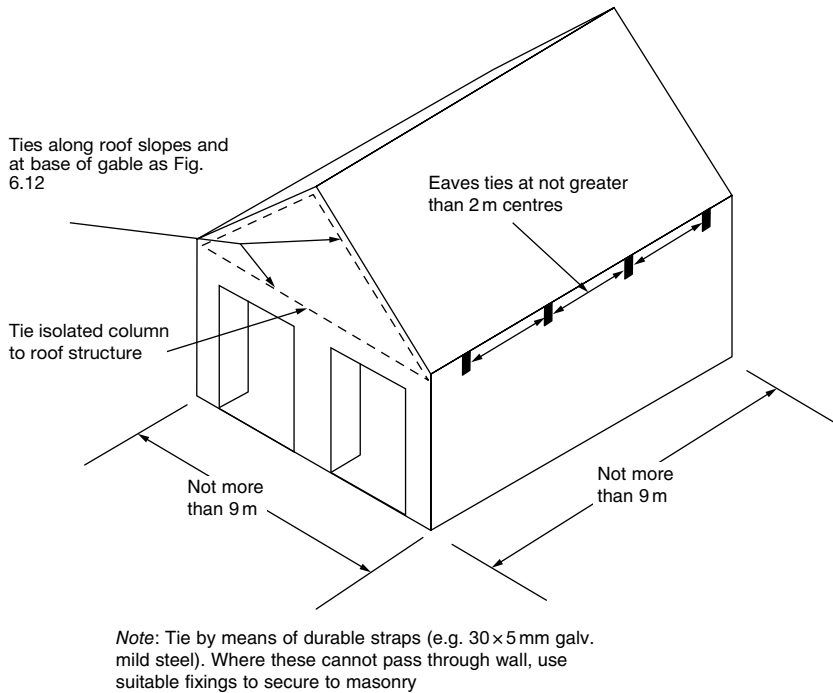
Small buildings and annexes – lateral restraint at roof level.
